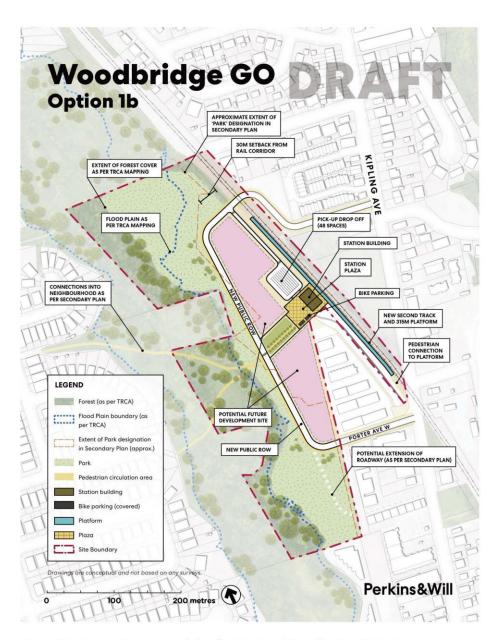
Option 1b conceptual plan for Site 1 and Woodbridge GO Station
